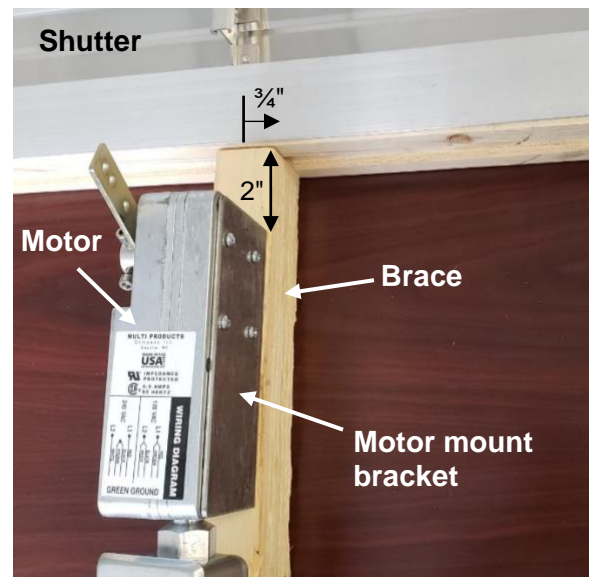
Motor mount bracket and motor installed onto the brace between shutter and door frame.
